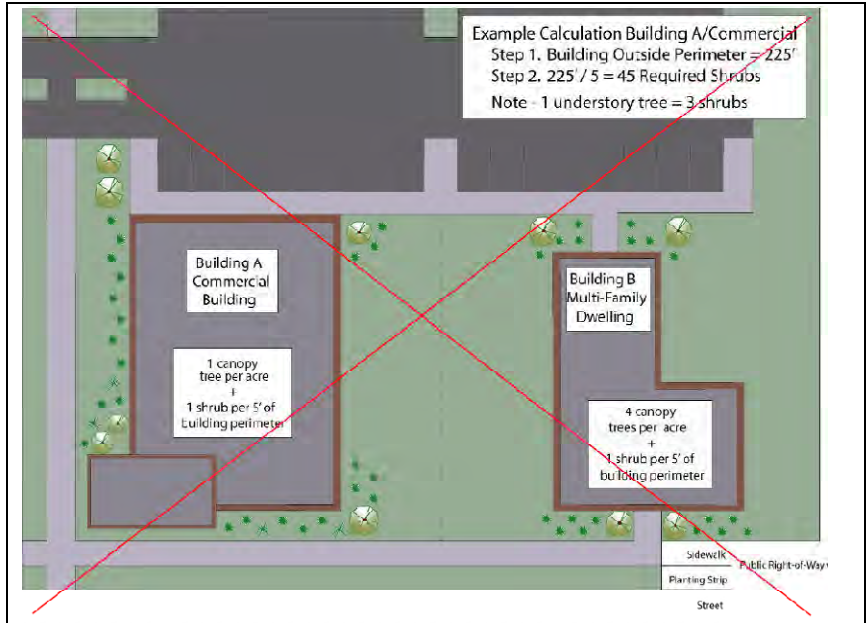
B.4.b: Site & Building Landscaping Placement
